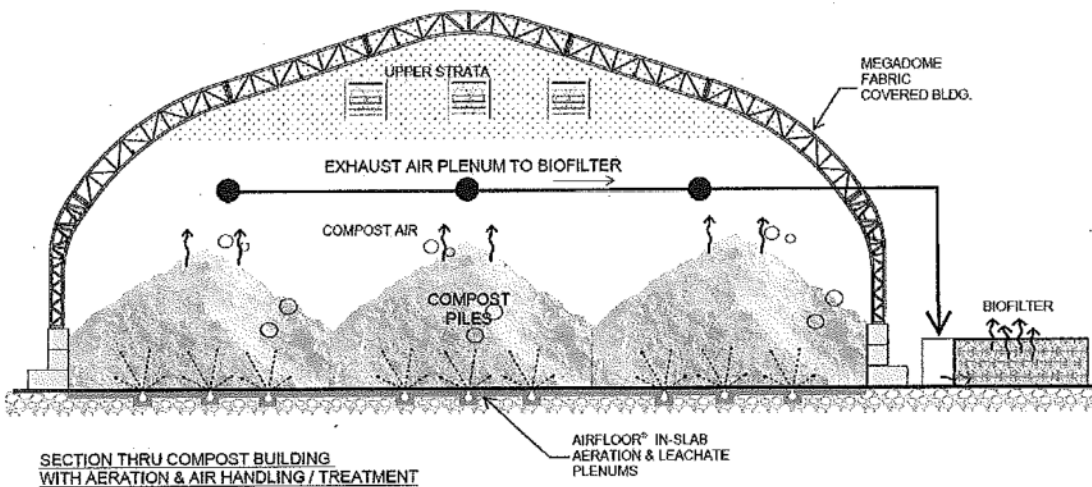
CROSS SECTION OF PRIMARY BUILDING AND HVAC / ODOUR CONTROL TO BIOFILTER
